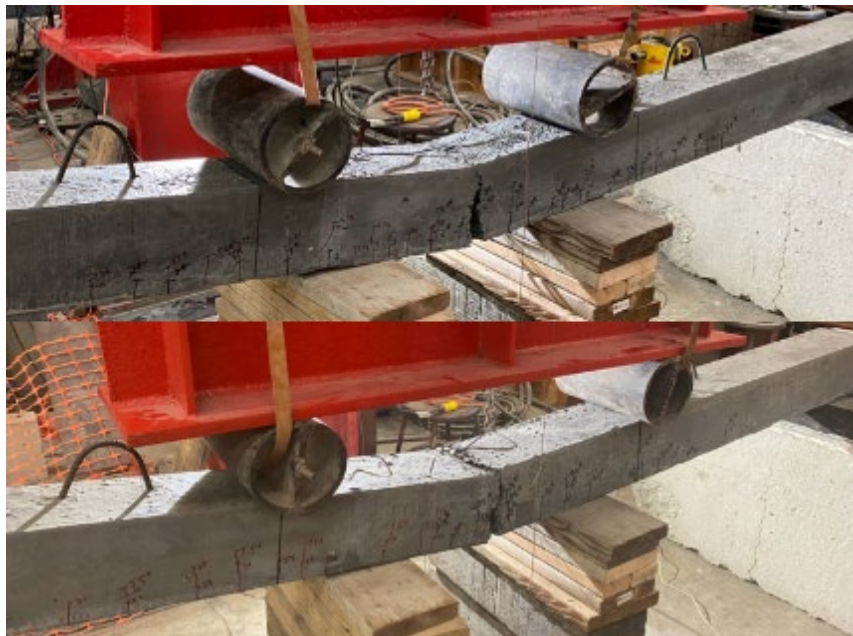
Crack patterns typical of SB-J5 with 1% fibers
